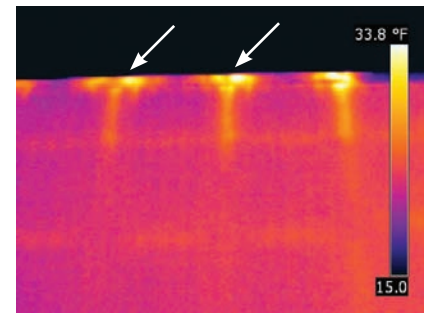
Air leakage at the top of a precast concrete wall with metal parapet flashing was detected with Infrared camera. The pattern of brighter areas at the top of the wall indicated that the air seals at the top of the precast panels were not continuous and warm air was exfiltration from the inside of the building.
